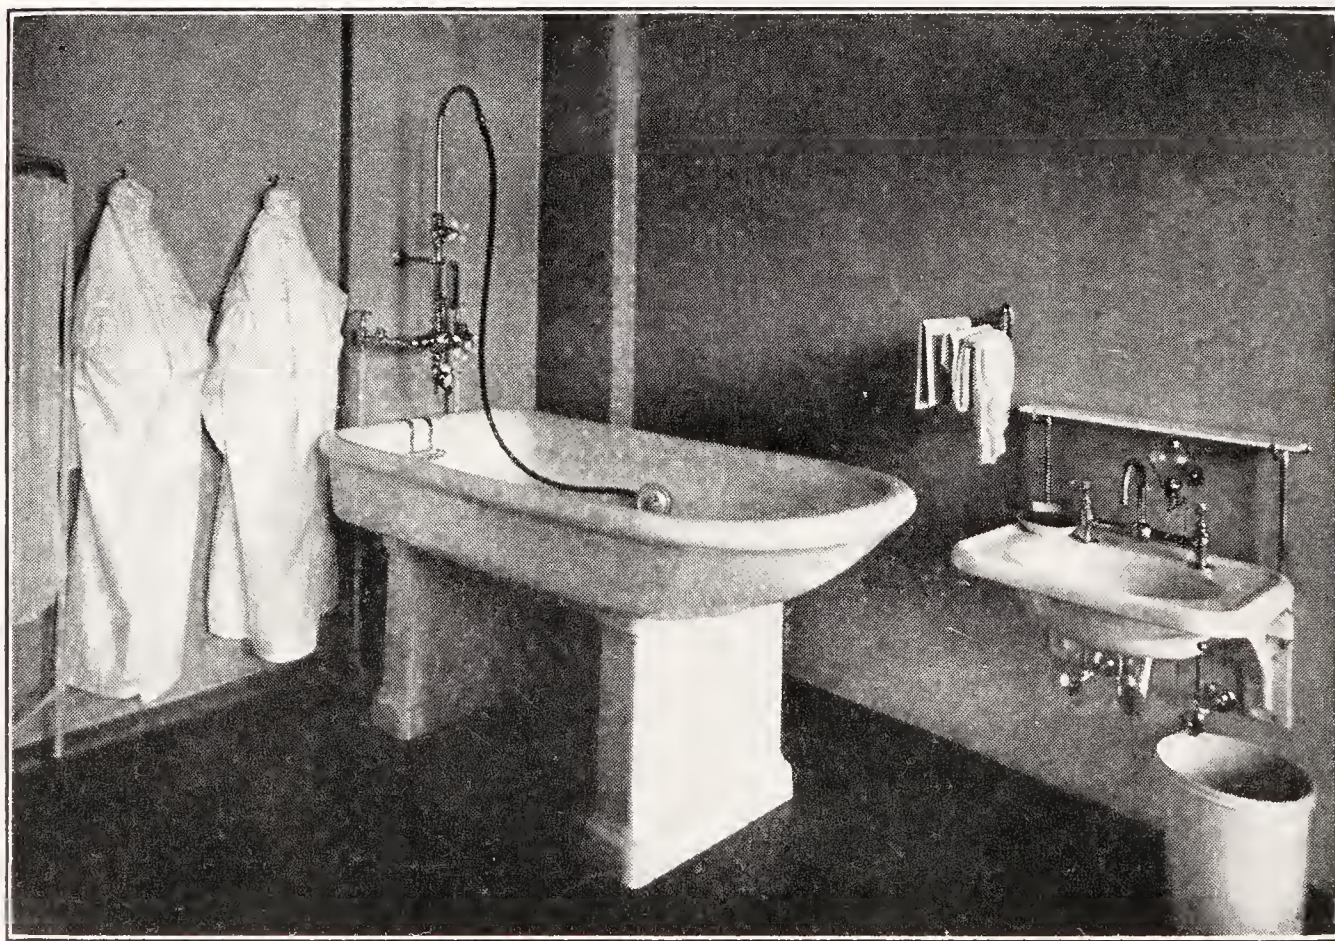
BATH IN ADMITTING ROOM, ISOLATION BUILDING, ST. LUKE'S HOSPITAL, JACKSONVILLE, FLA.
